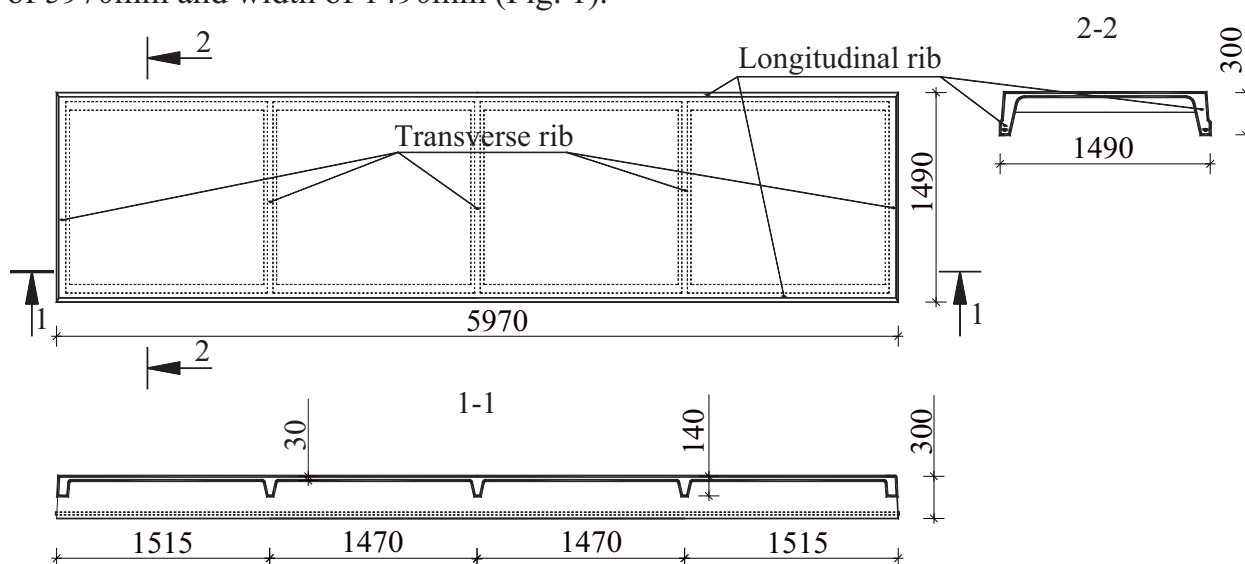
Top view, longitudinal and transversal section of a precast ribbed panel
